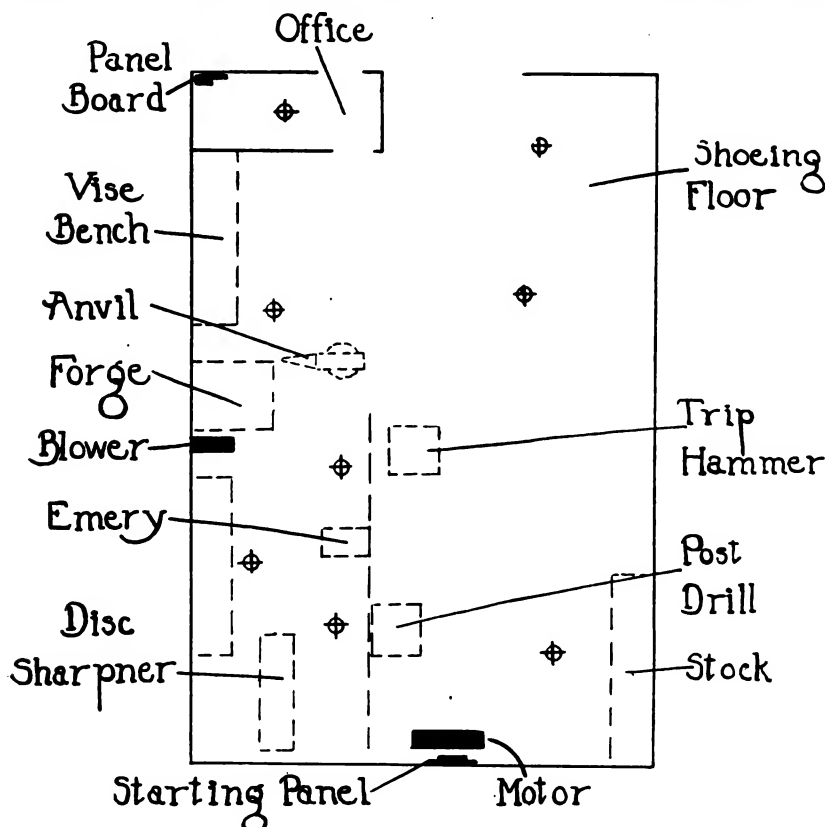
FLOOR PLAN OF SHOP WITH LIGHTS AND MOTOR INDICATED
